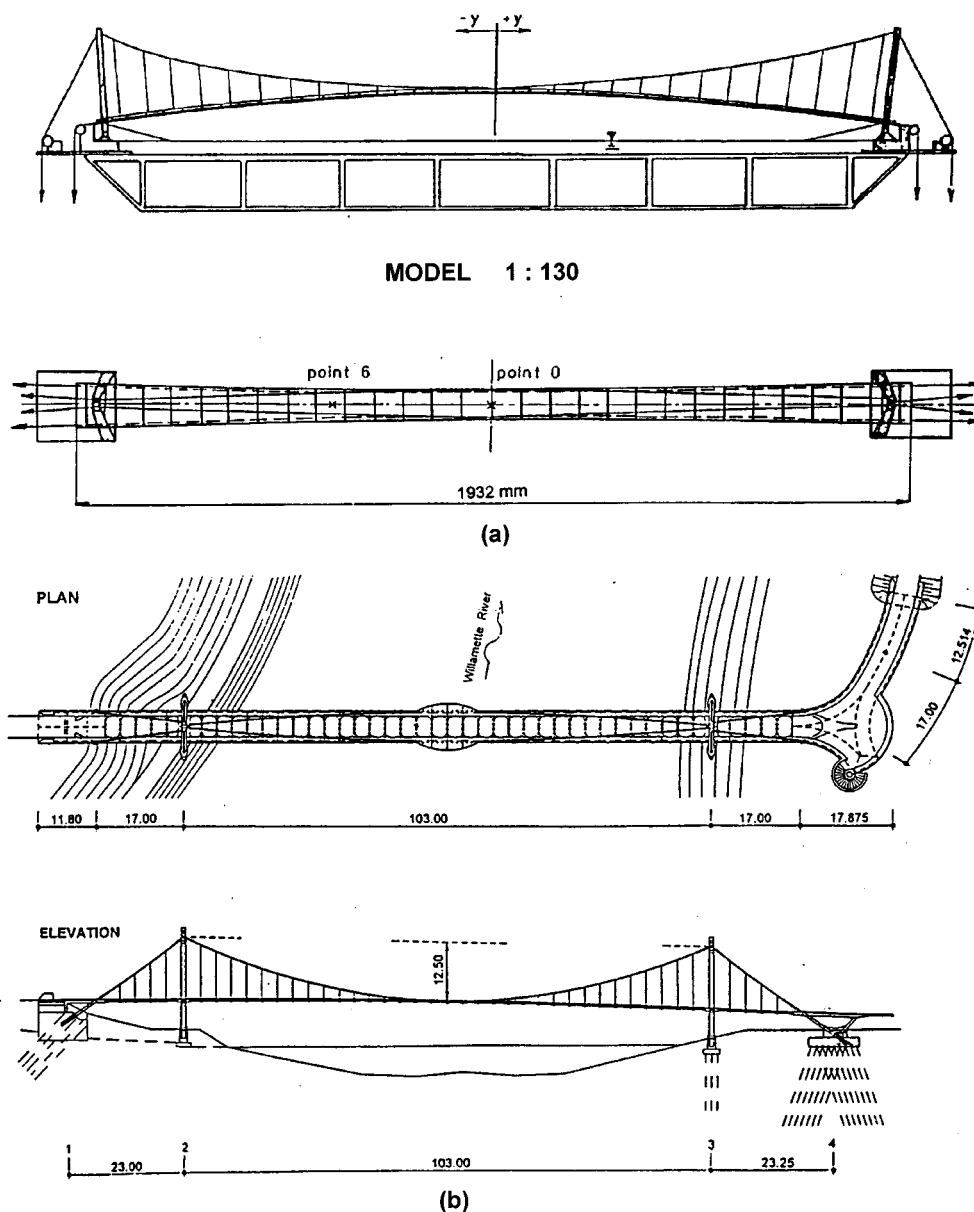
(a) A footbridge suspended on 2 cables with the bridge-deck prestressed by a pair of tendons, span 252 m. Aeroelastic model, scale 1:130, (b) A suspended footbridge-prototype structure, dimensions in [m]
